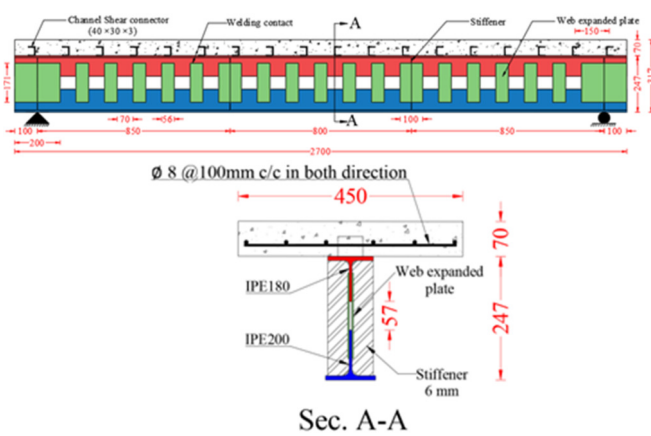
Details of the BS-E30-T3-L70 specimen.
